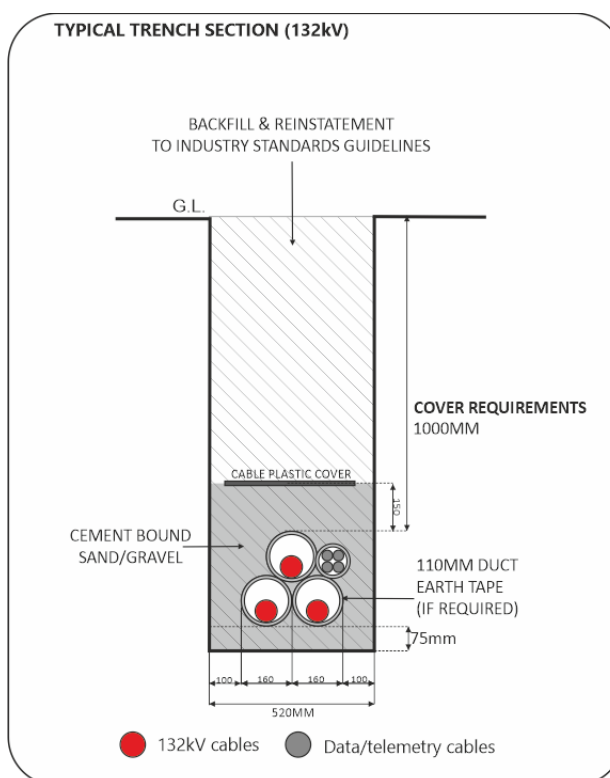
Typical trench dimensions of DNC Connection (without CHP Connection)
